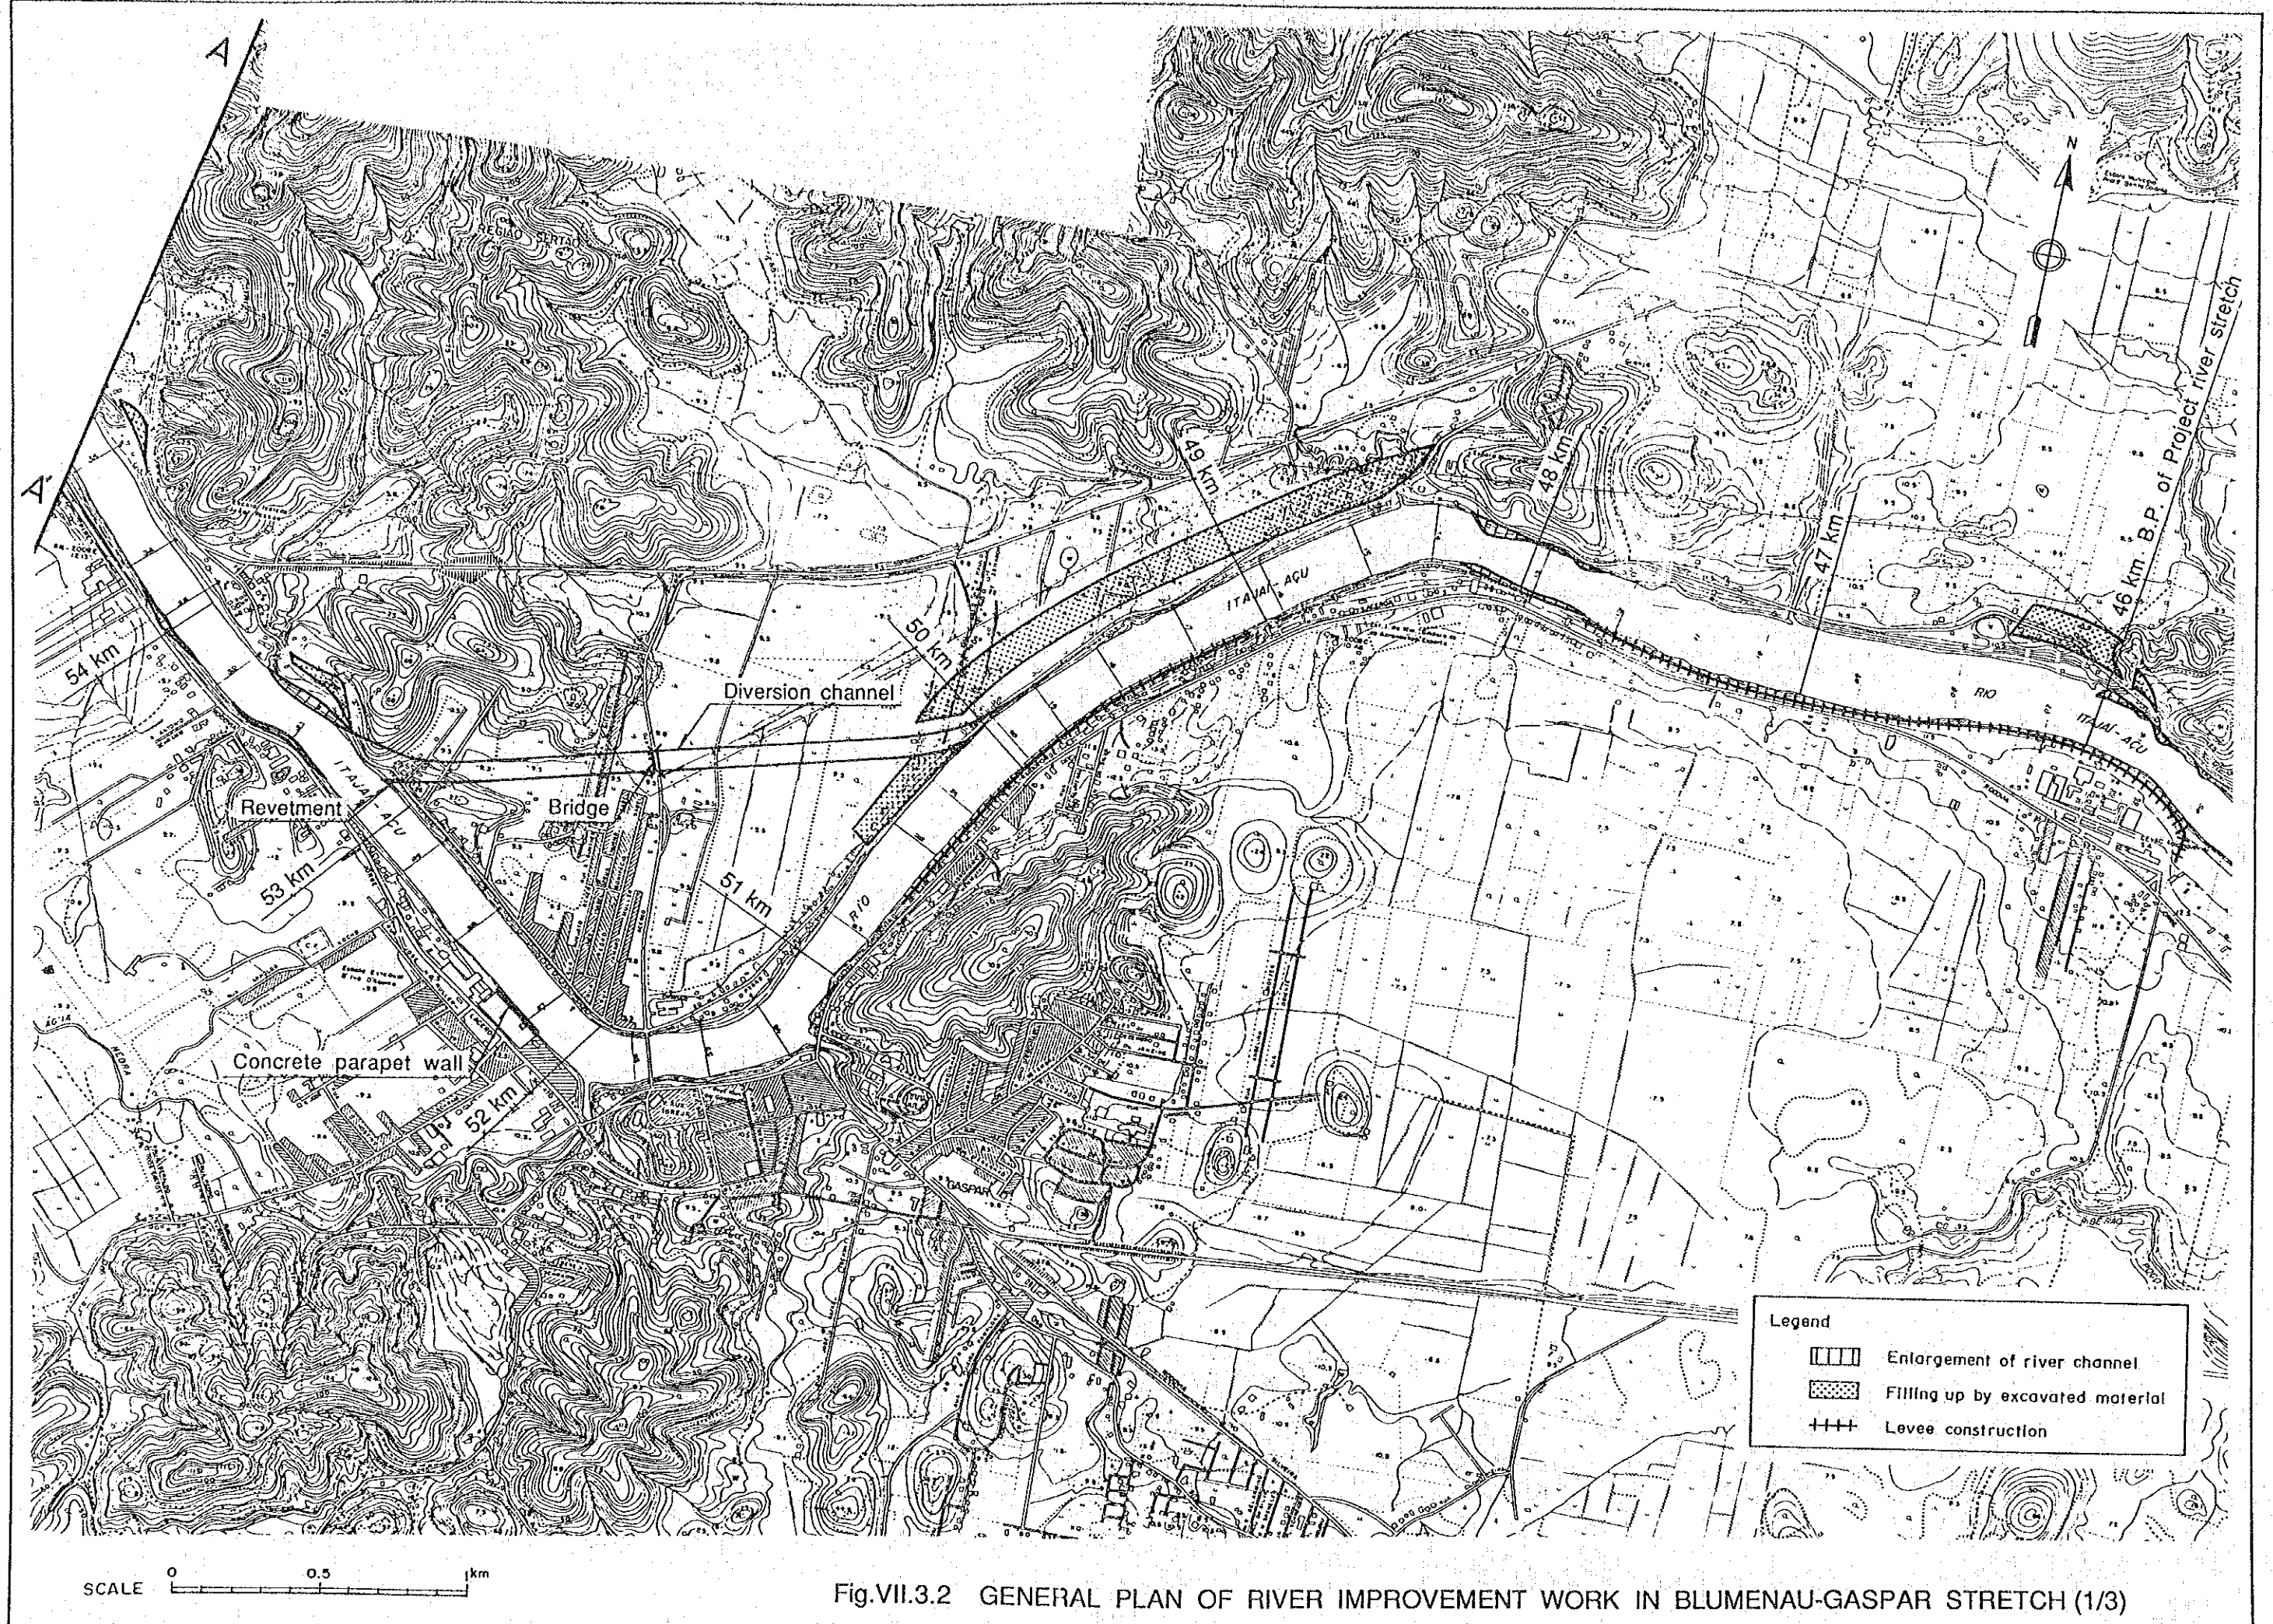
GENERAL PLAN OF RIVER IMPROVEMENT WORK IN BLUMENAU-GASPAR STRETCH (1/3)
